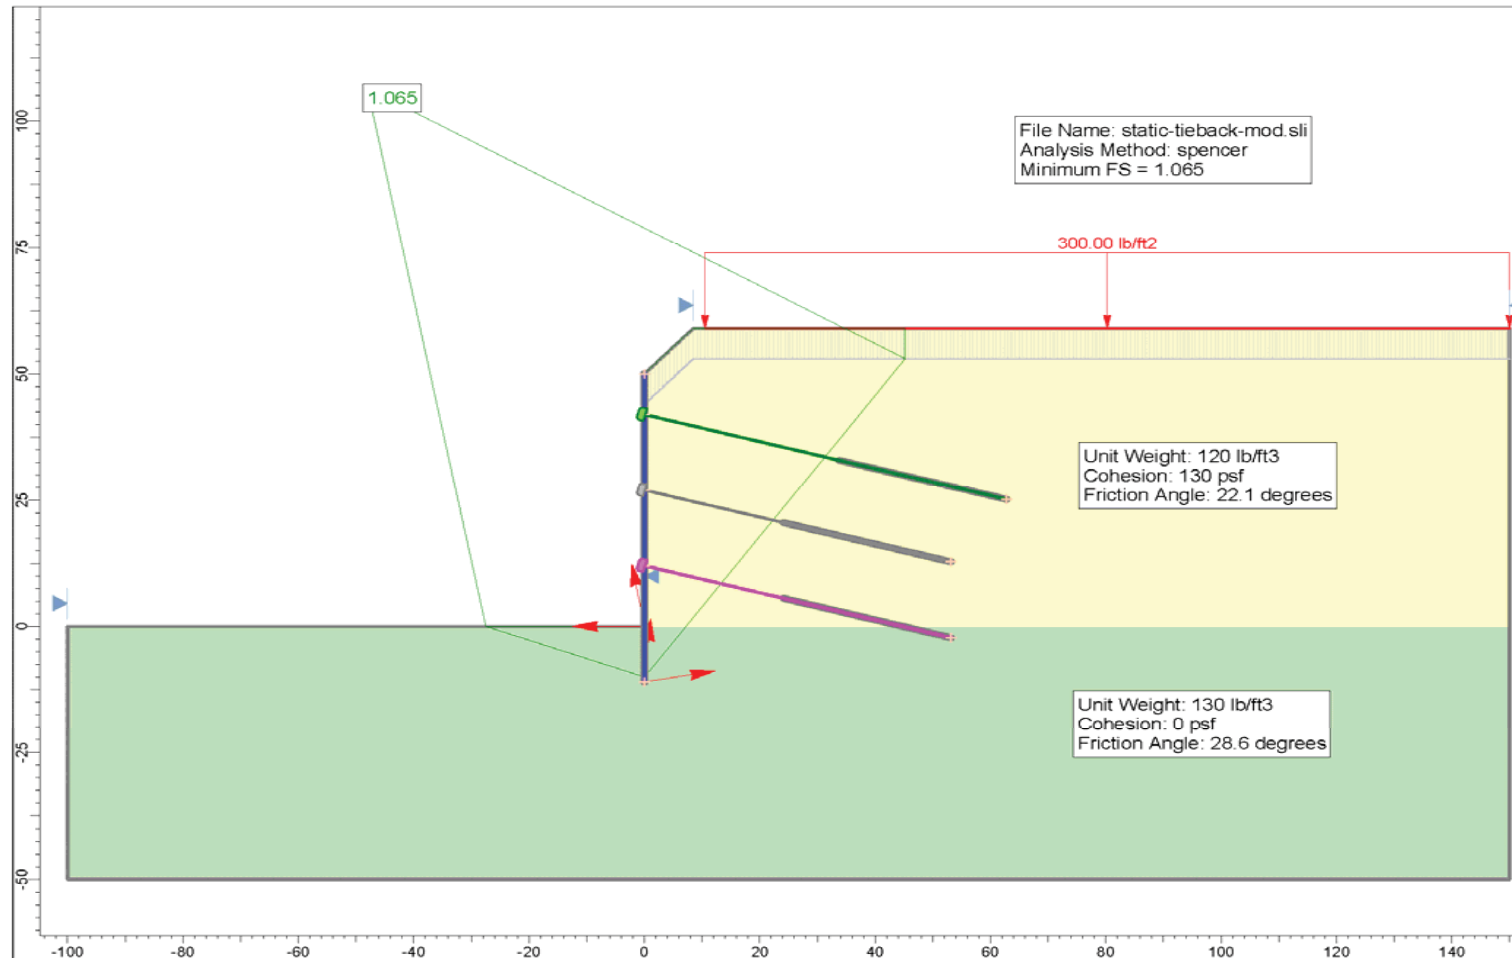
Global Stability for Static Condition, Planar Failure Surfaces, Revised Anchor Loads
